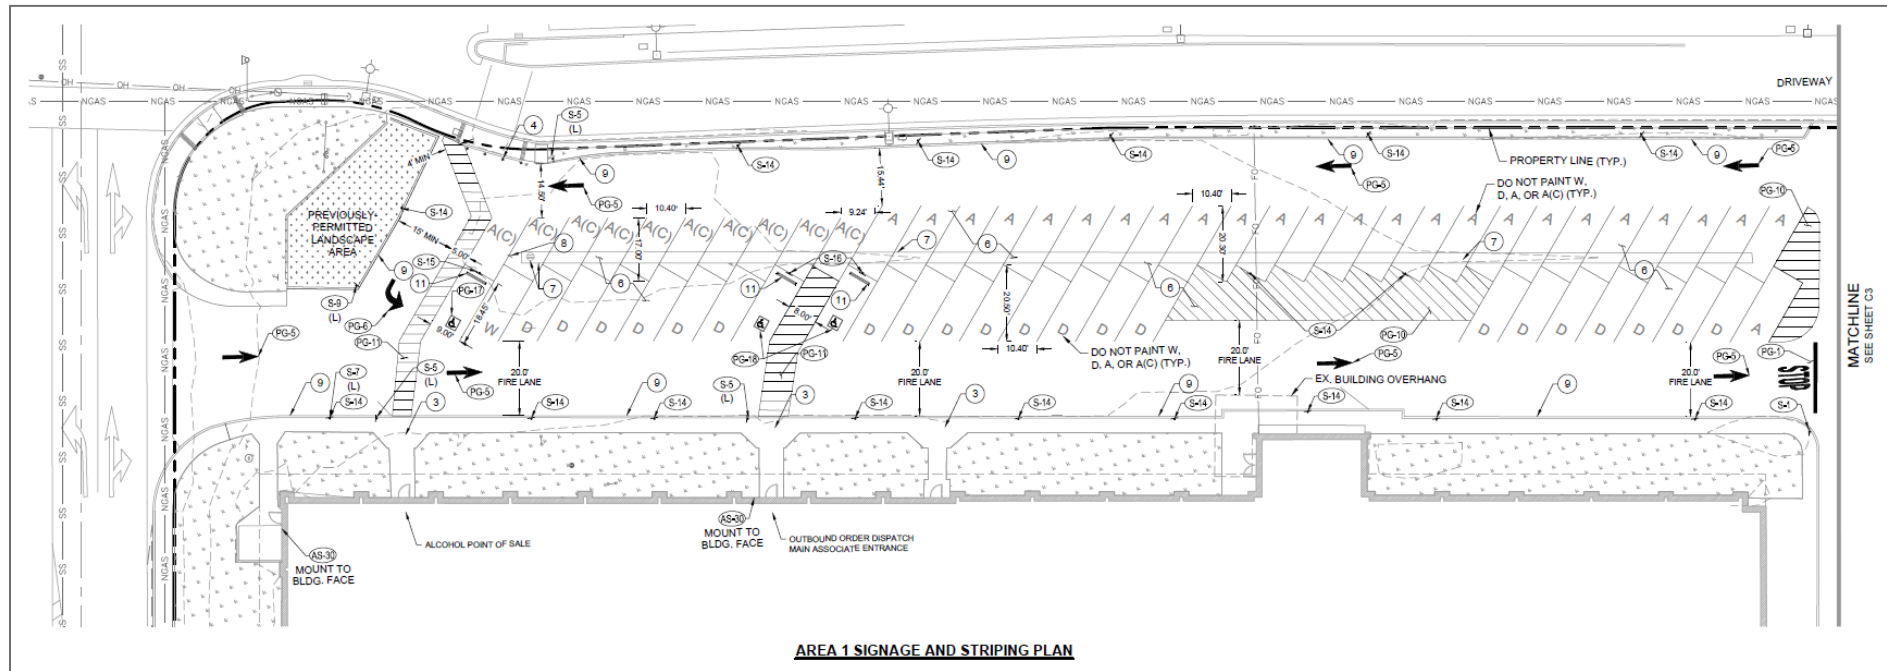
SIGNAGE AND STRIPING PLAN FOR USF2 FACILITY PARKING, NORTH OF USF2 FACILITY
